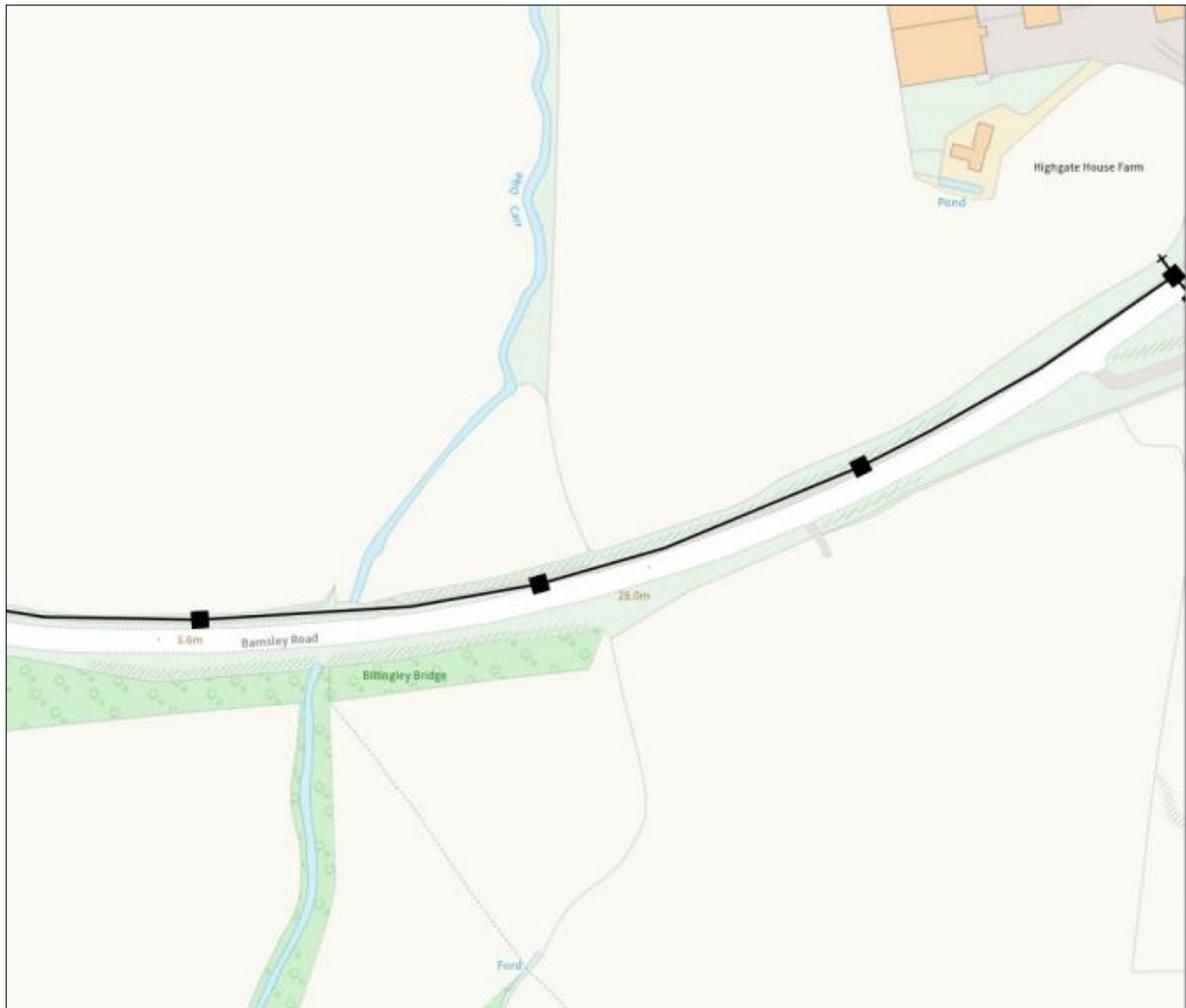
Existing Openreach underground ducts and chambers in the A635
